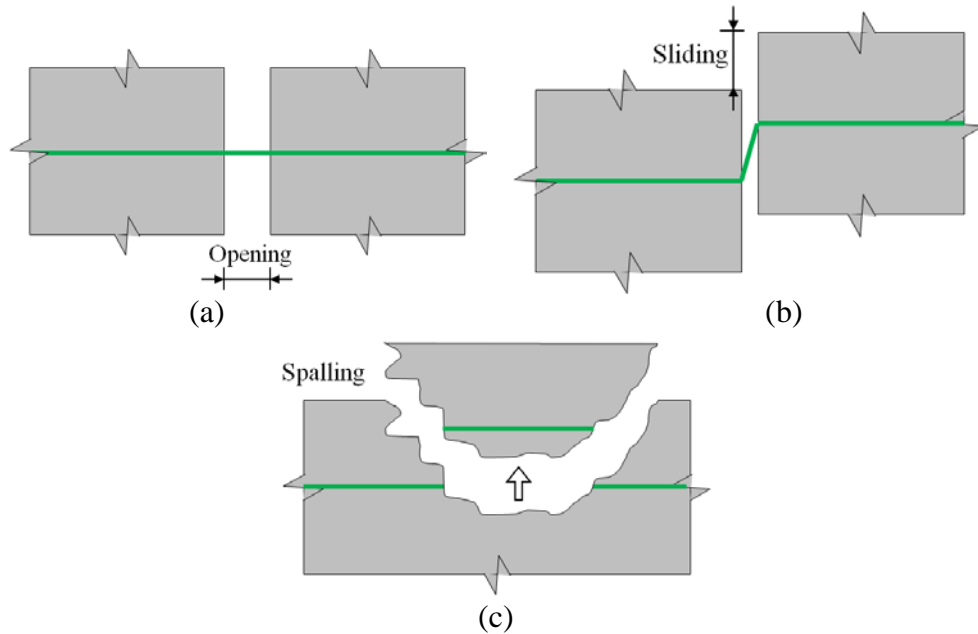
Fiber optic sensor behavior under: (a) crack opening (mode I); (b) crack sliding (mode II); (c) spalling
